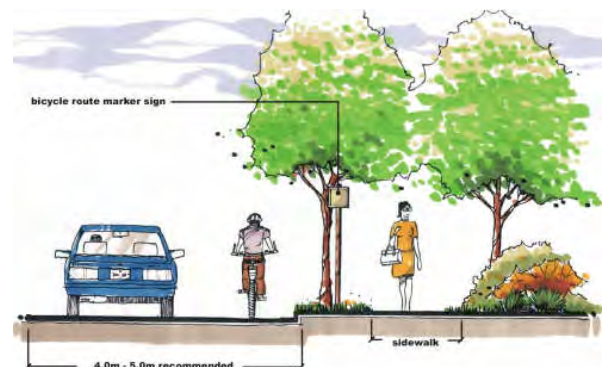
Schematic for a Multi-Use Trail Boulevard or Sidewalk in Boulevard Right-of-Way
